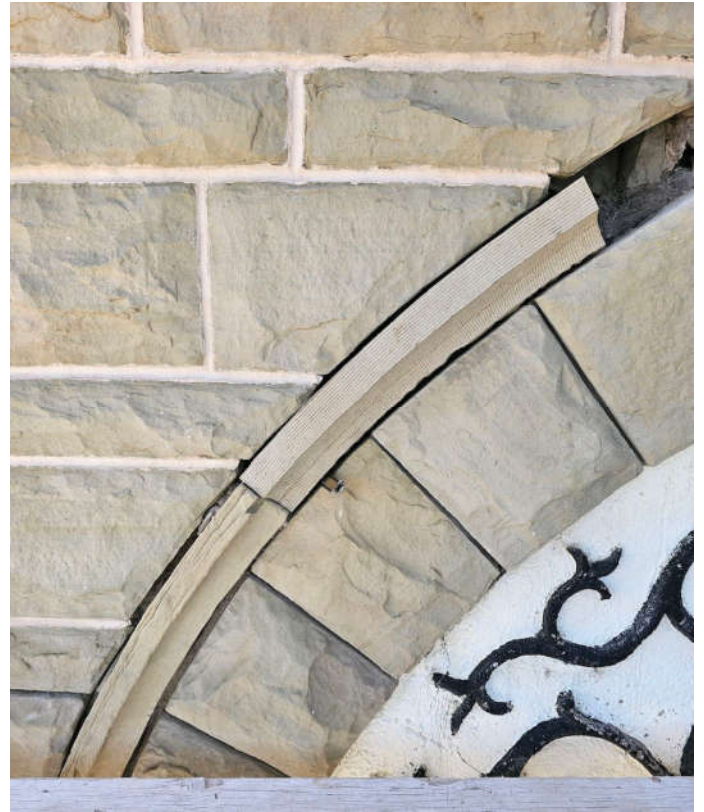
A replacement piece of radiused stone moulding above the plaster sign was fabricated by Mountain Masonry. (Photo Source: Mountain Masonry)
